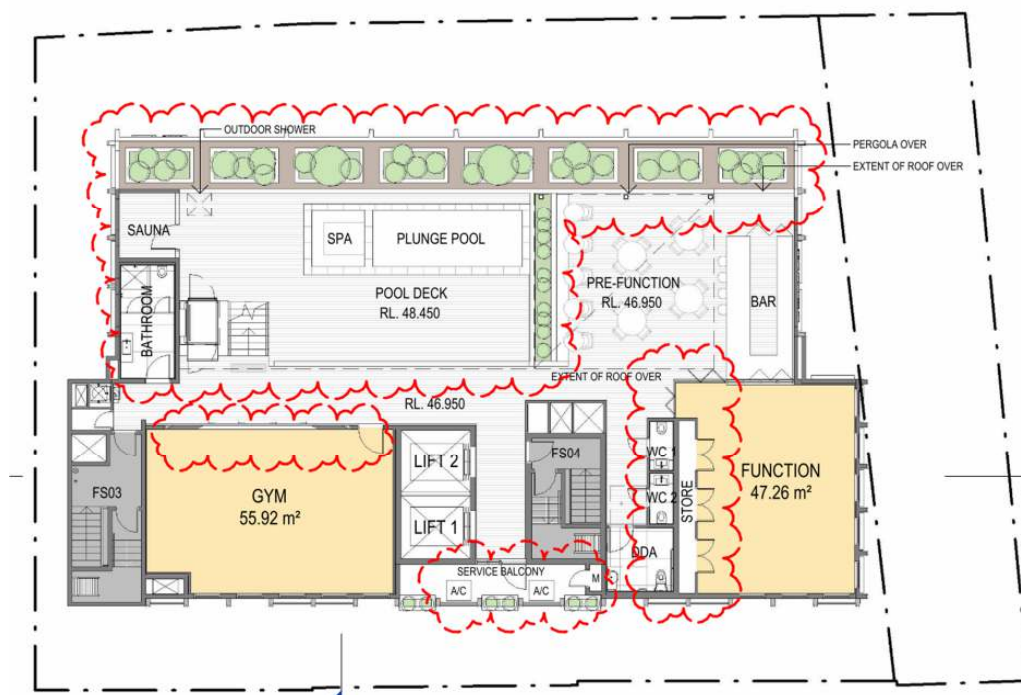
Plan of the proposed plunge pool and facilities on level 12 on top of the building
